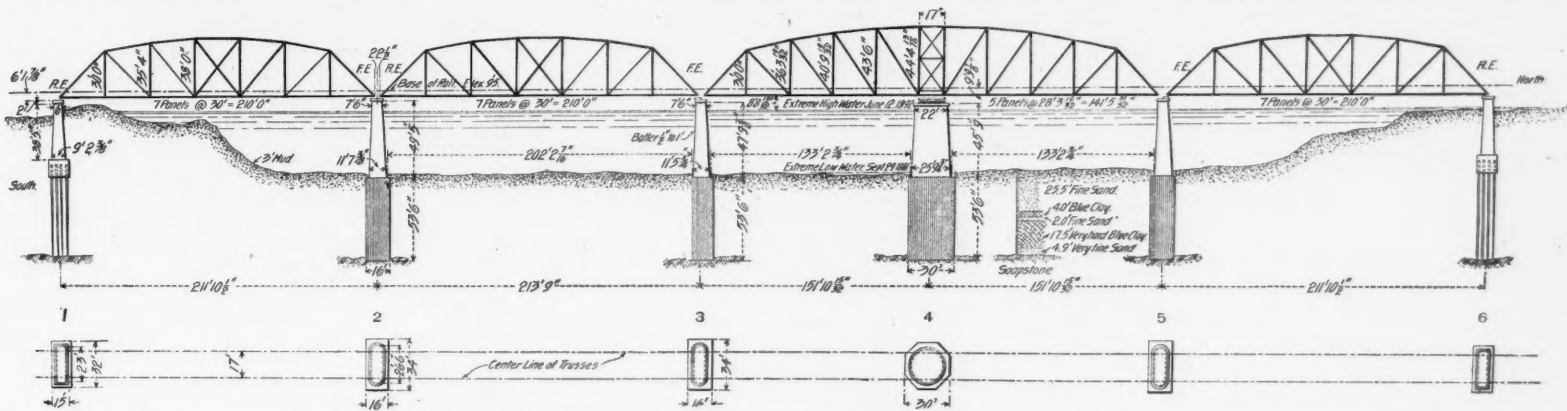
General Plan and Elevation of the Red River Bridge at Alexandria, La.
